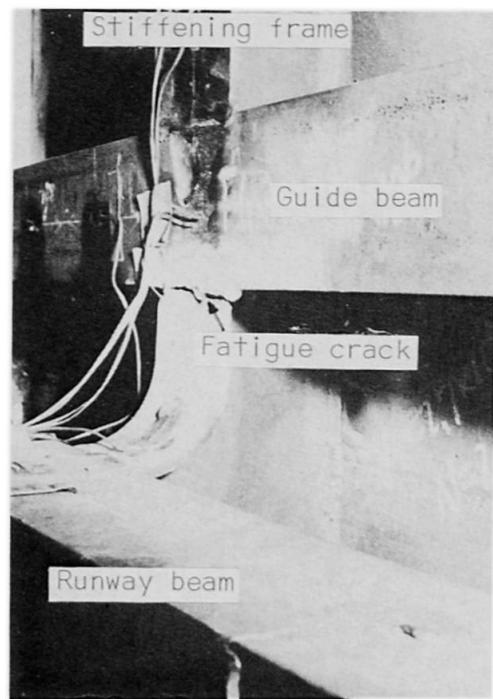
Fatigue crack initiation at stiffening frame corner
